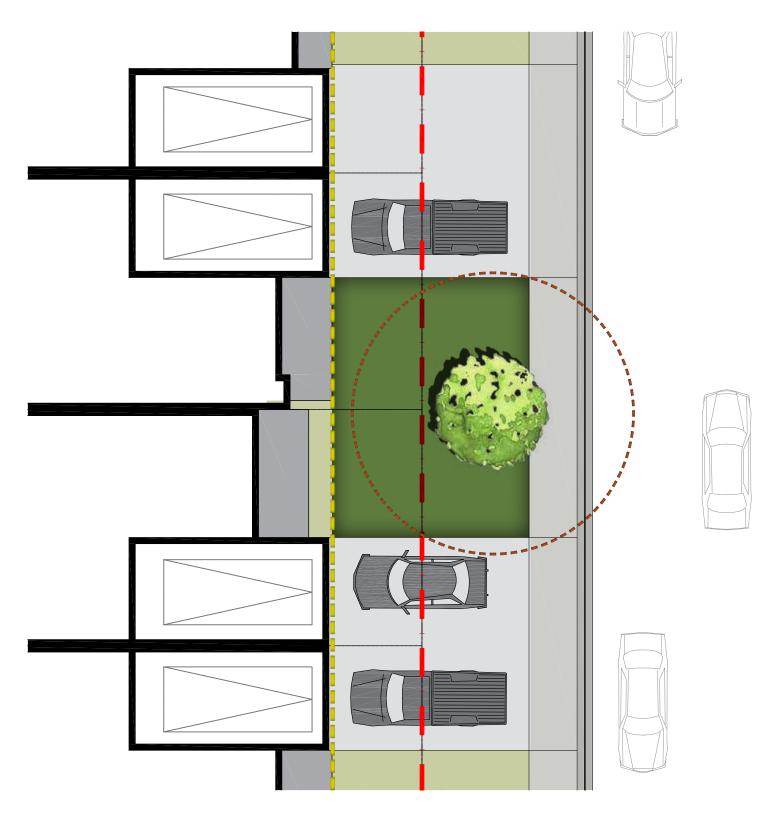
Tree Planting Setback - 25' Townhomes on 18.0m Local Road
